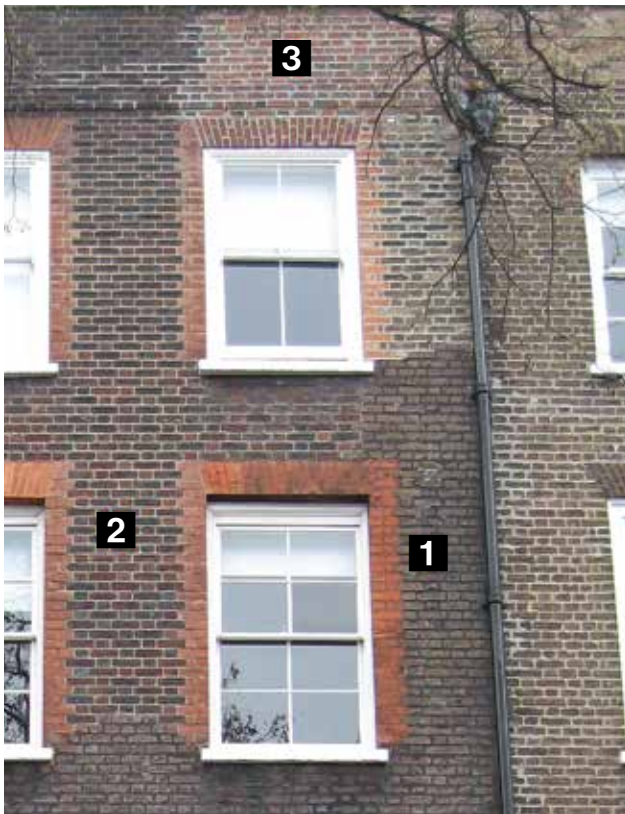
Detail of the unrestored front façade in 2008 showing original work (1), the 1900 resurfacing at second and third floor levels (2) and poor 2002 repair work which had used metric bricks and crude repointing in cementitious mortars (3)
